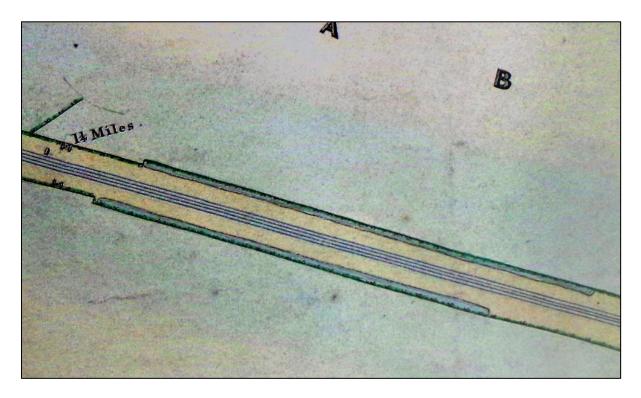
An open drain running alongside the trackbed at 1 ¼ miles. Plan by Thomas Dixon 1839 (PRO RAIL 1037/459)
